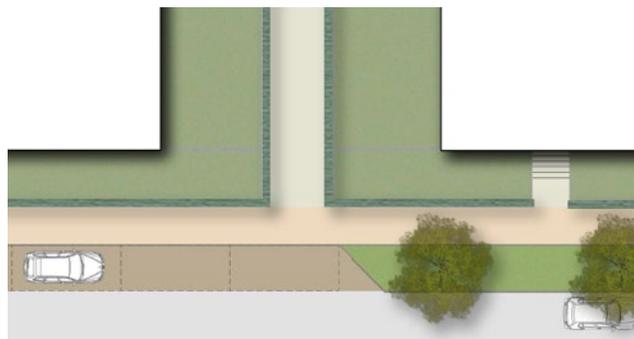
Illustrative diagram showing an indicative layout of on-street inset parking.
